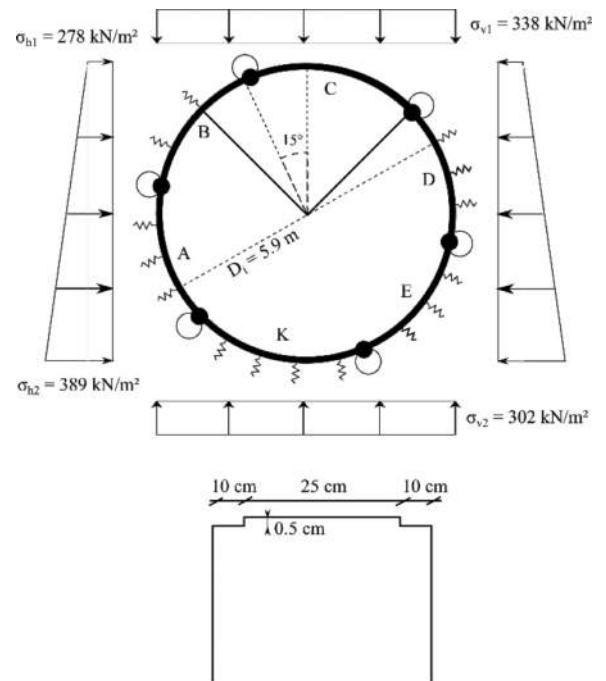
Example case, upper: model geometry and loads., lower: longitudinal joint detail.
